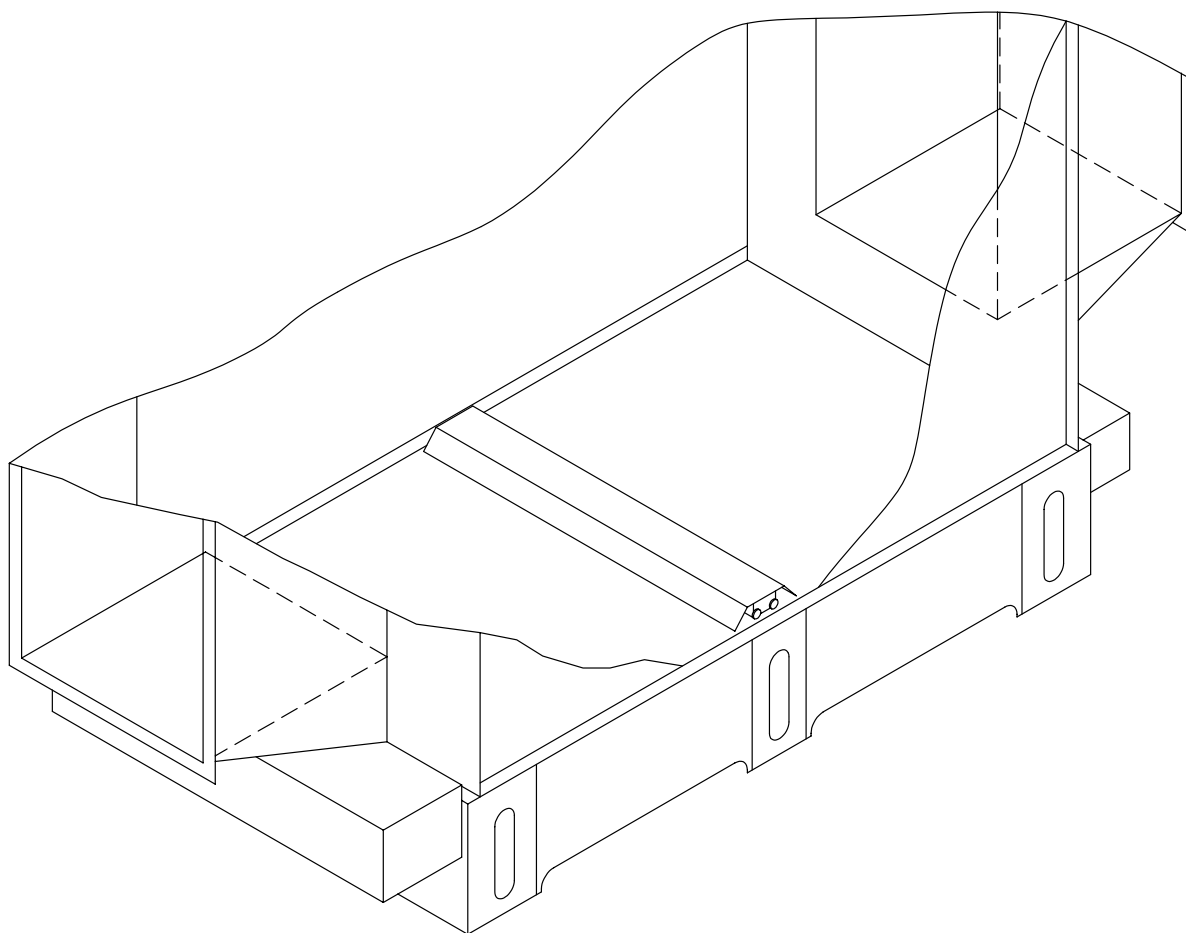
Typical Isometric View of a Booth Sweeper
